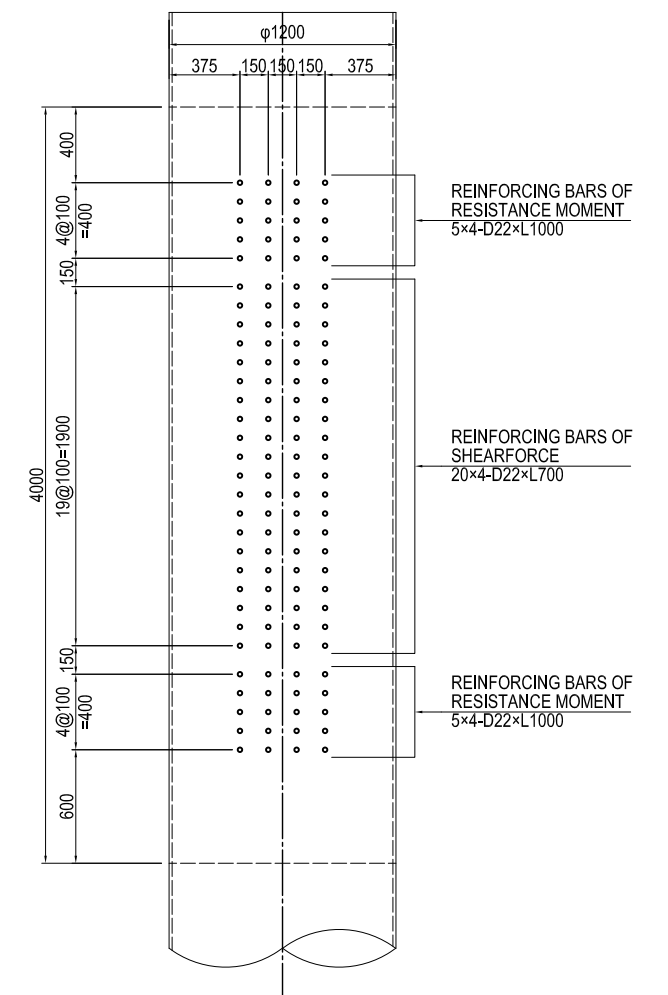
DETAIL OF CONNECTION BETWEEN STEEL PIPE SHEET PILE AND FOOTING S=1:40
